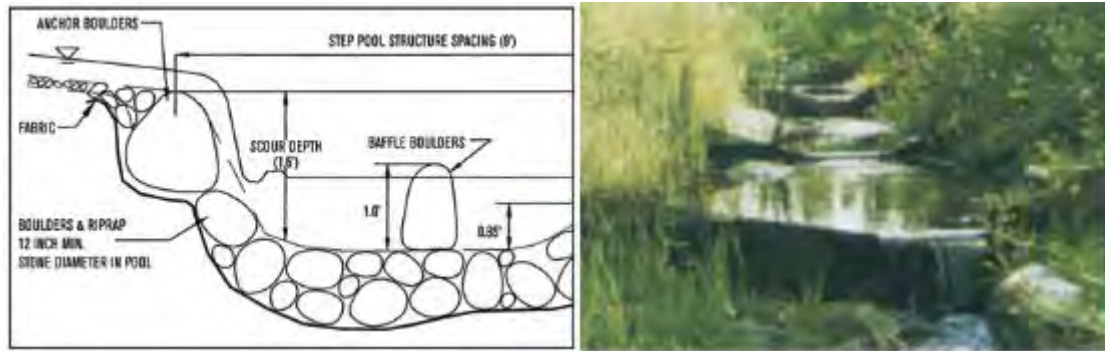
Cross section of a typical stepping pond. Photograph of a ditch beam made by “Geo-ridges”
